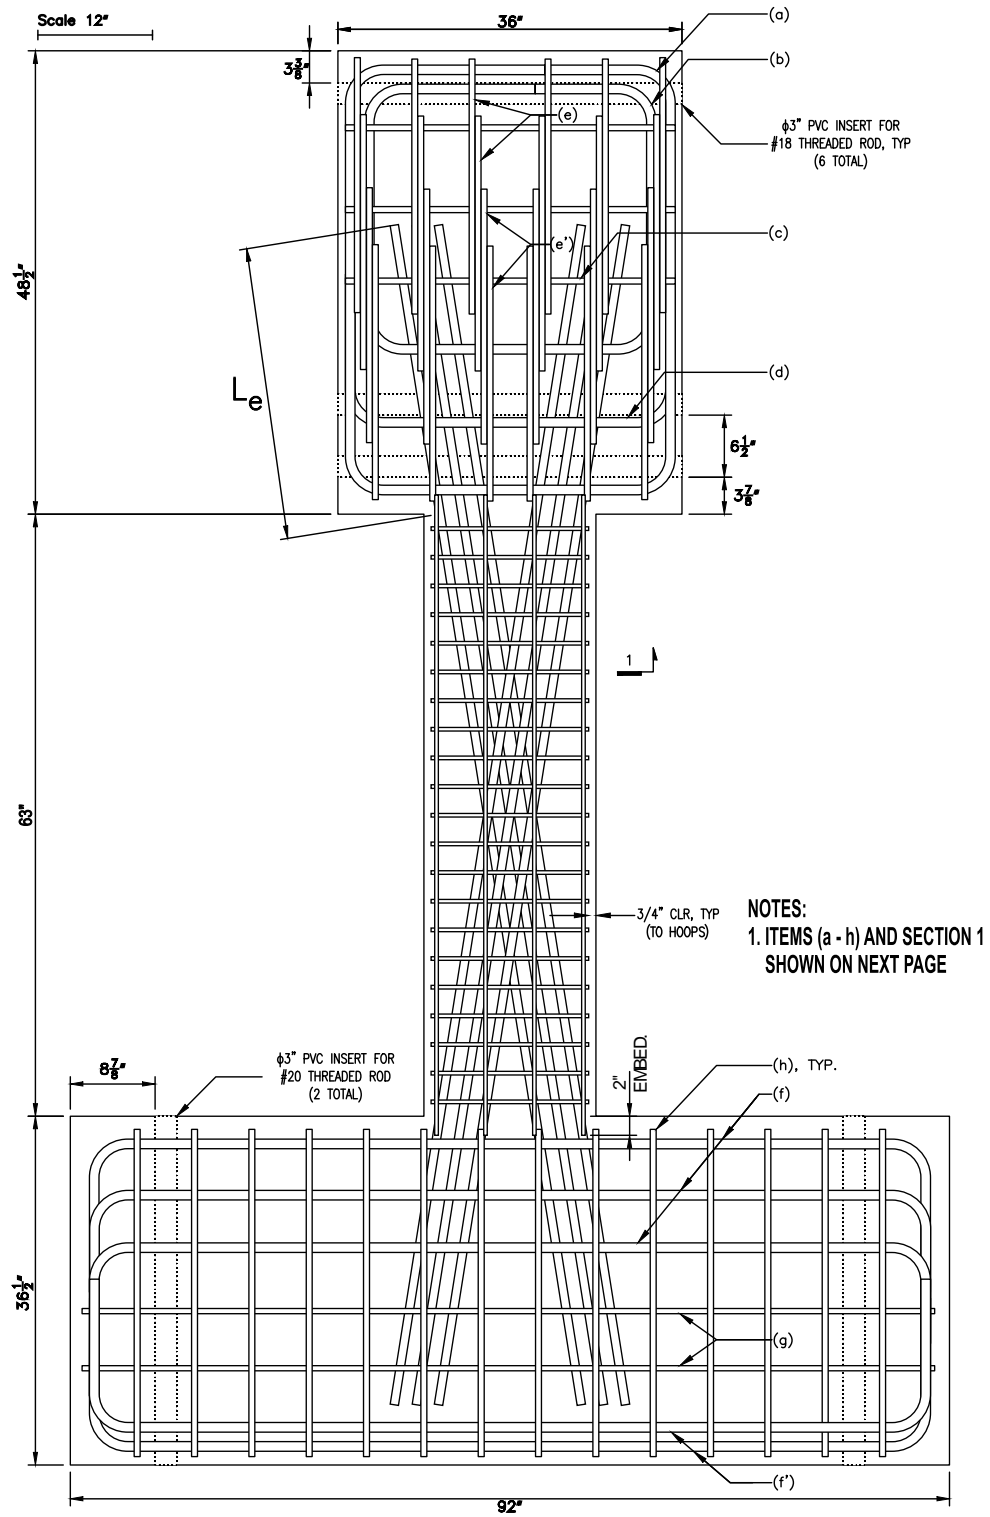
Elevation view of D80-3.5 (1 in. = 25.4 mm)
